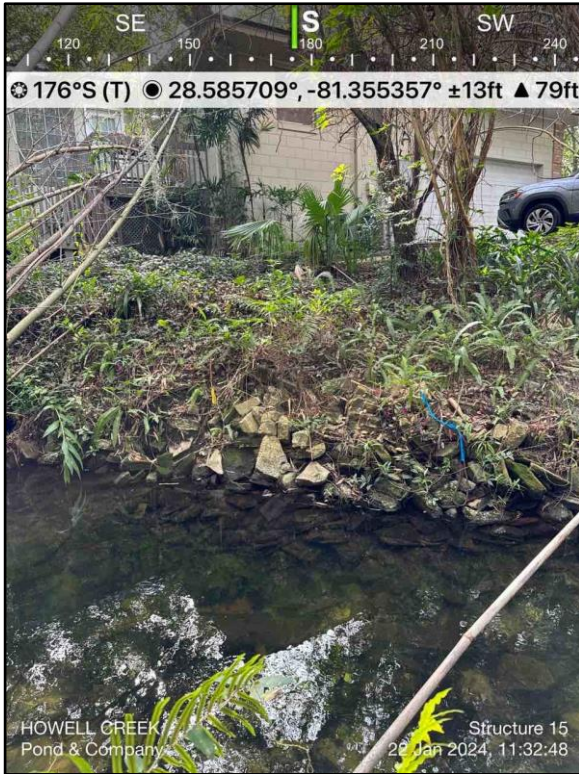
S Pennsylvania Ave. Crossing and Adjacent Sheet Pile/Rock Streambank Protection
